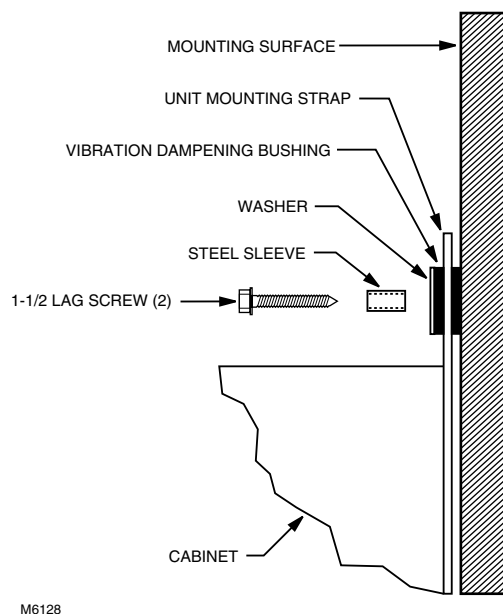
Typical mounting when unit is mounted to a wall with four lag screws (one shown).
